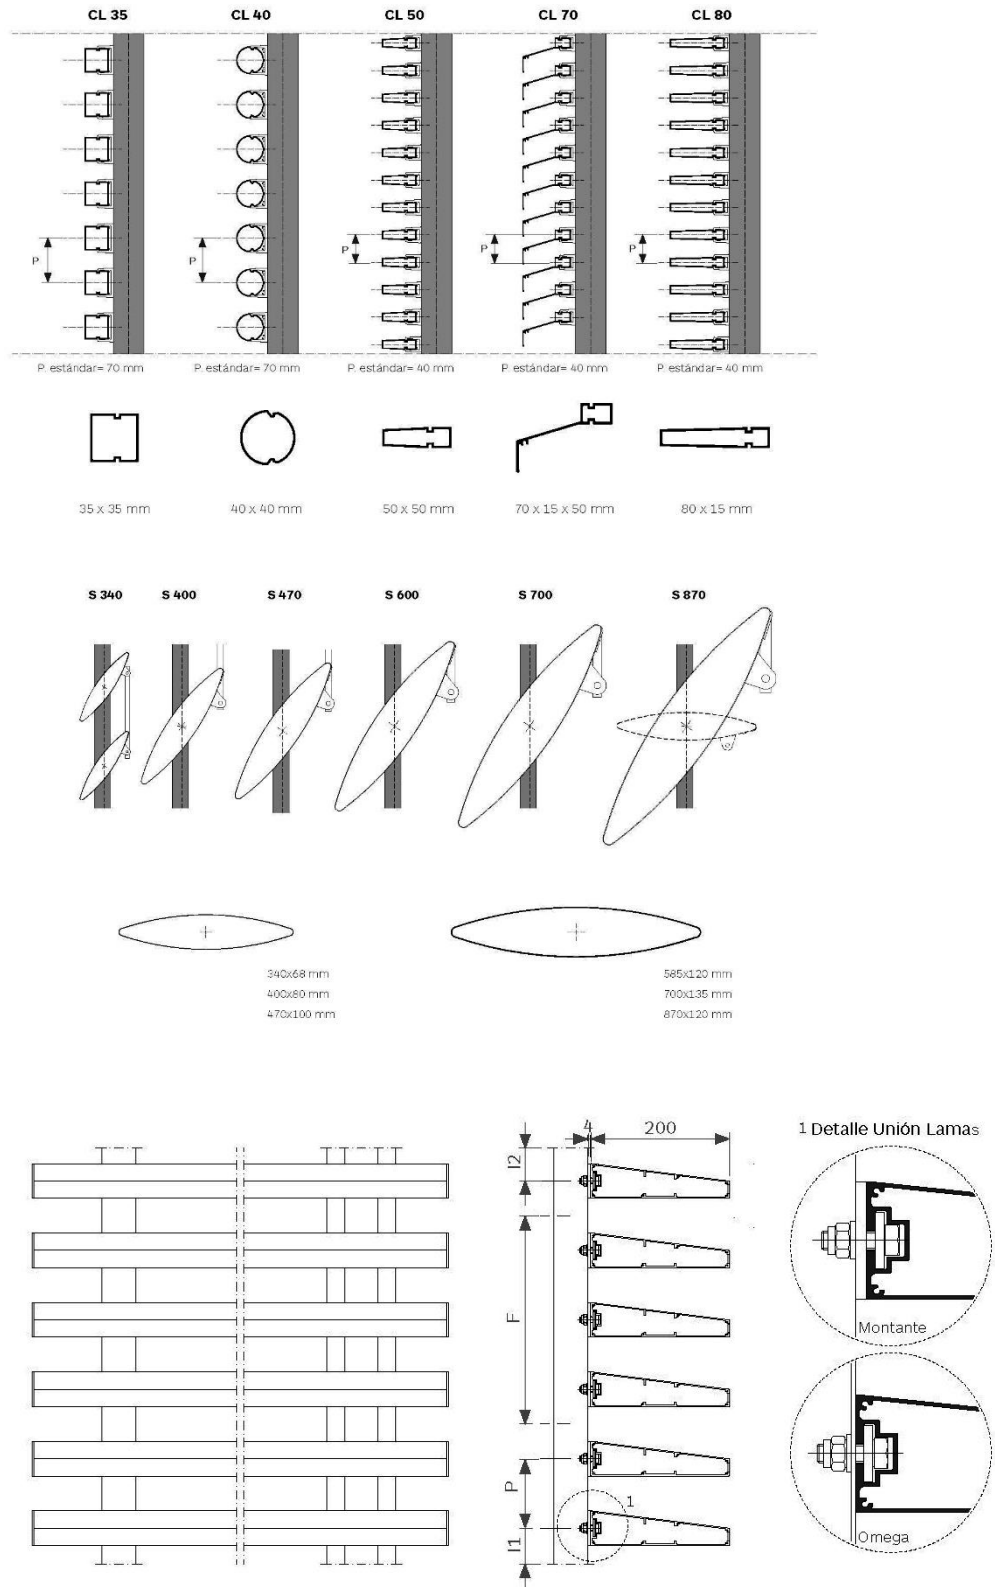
Sections of horizontal louvers having different shapes (Source: ArchDaily) Vertical fins protect window facades, from east and west low-angle sun. Overhang and fins combined, can be applied to buildings in hot climates.
